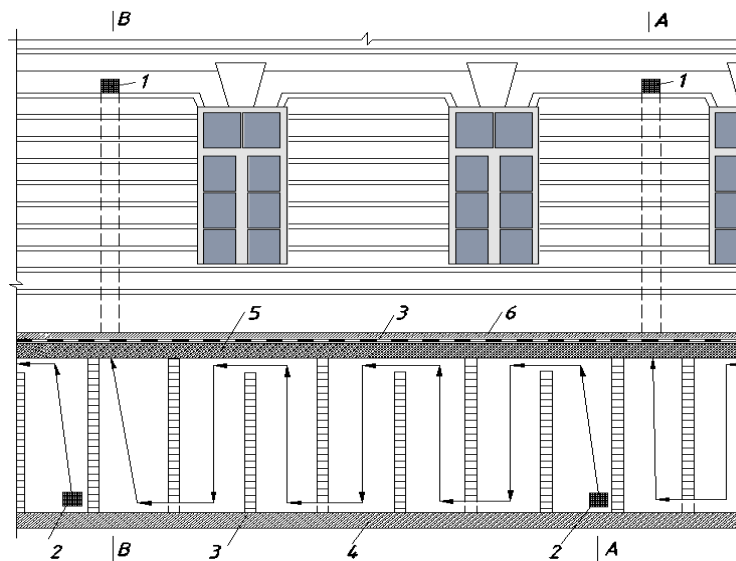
Figure 6 - Longitudinal section of the ventilation duct
